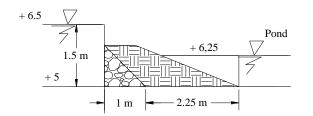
Existing conditions of perimeter embankment. (Source: Fidari et al, 2017).
